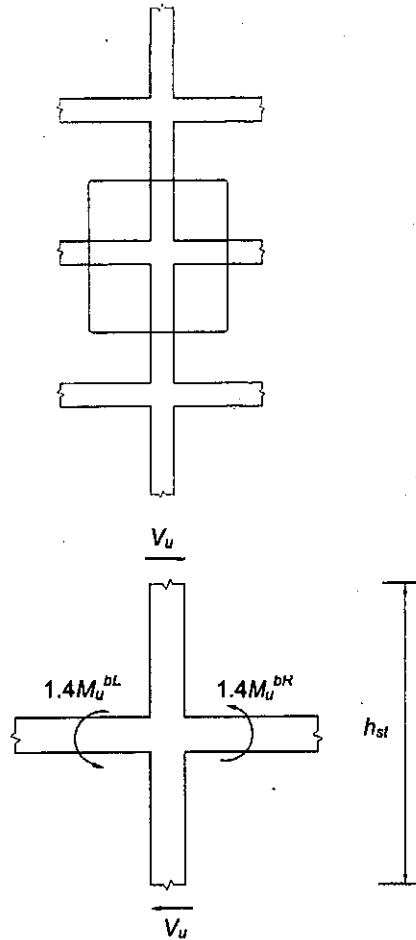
EQUILIBRIUM DESIGN SHEAR FORCE DEMAND ON COLUMN WHEN PLASTIC HINGES ARE FORMED AT BEAM ENDS
